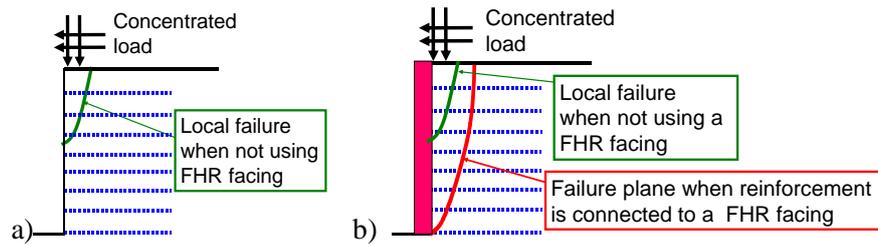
Failure of reinforced soil RW when subjected to concentrated load near the wall face at the crest of wall: a) deformable facing; and b) FHR facing connected to reinforcement layers.
